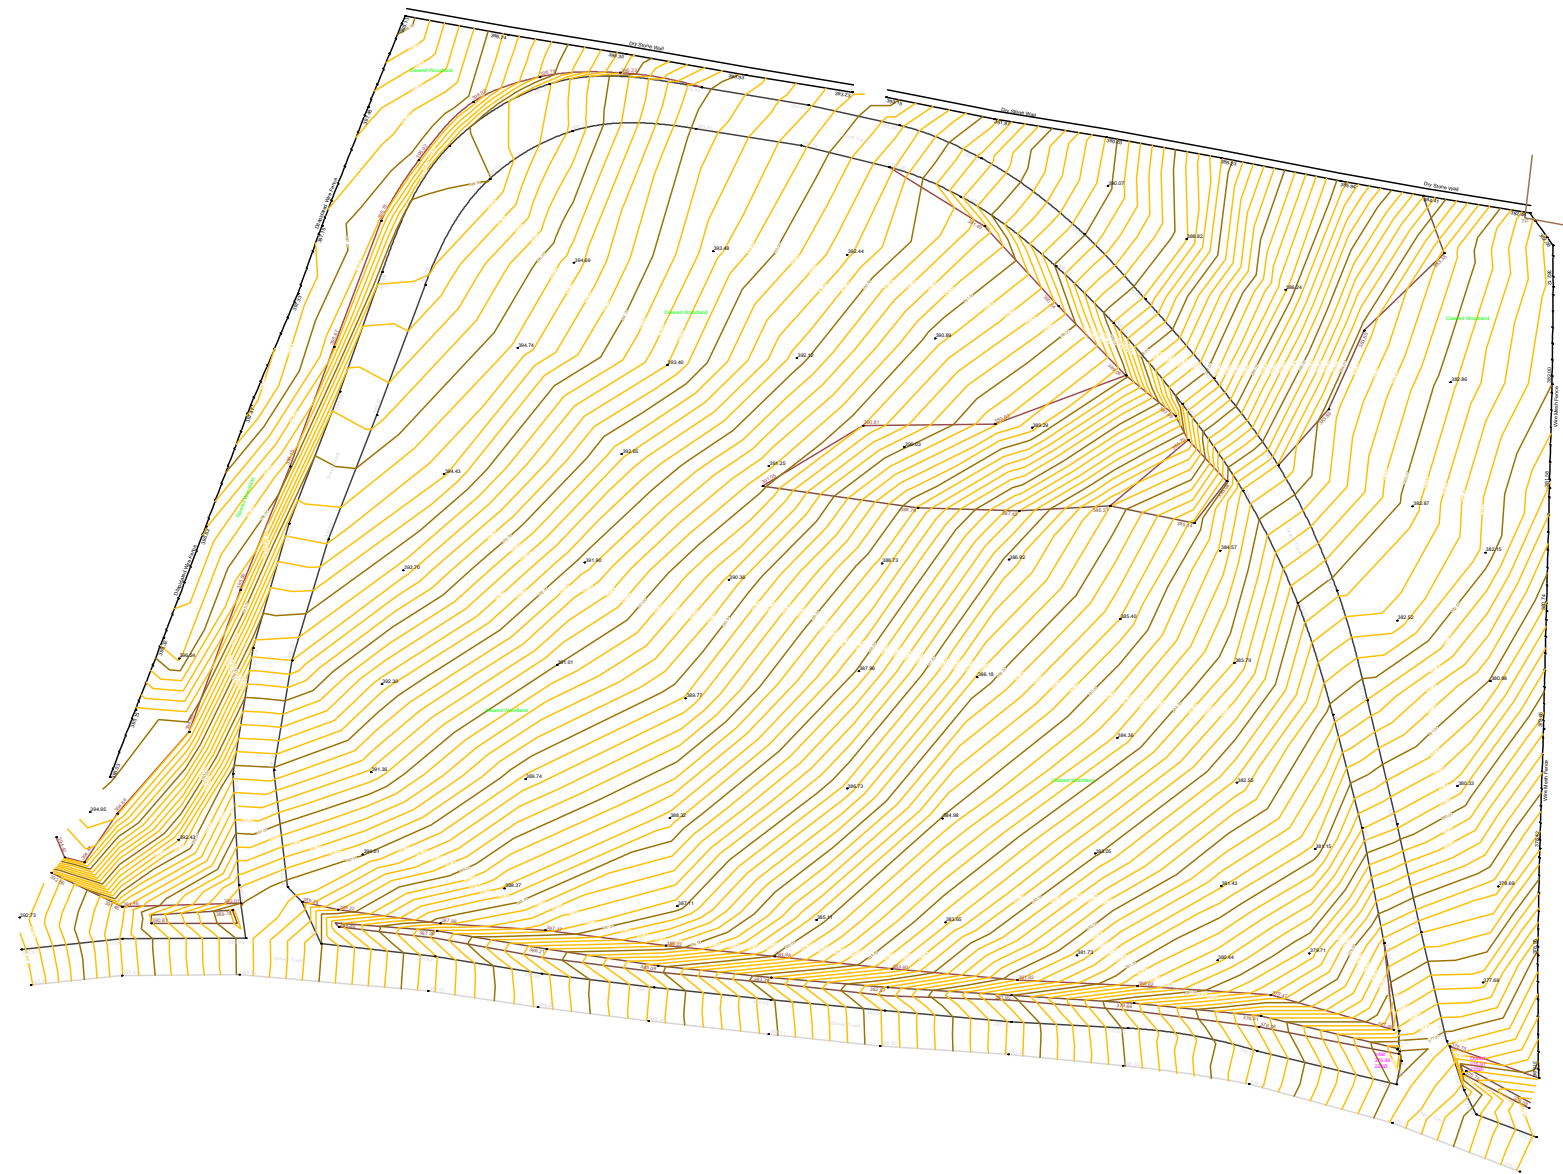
Existing Site drawing with topographic levels NOT TO SCALE.
